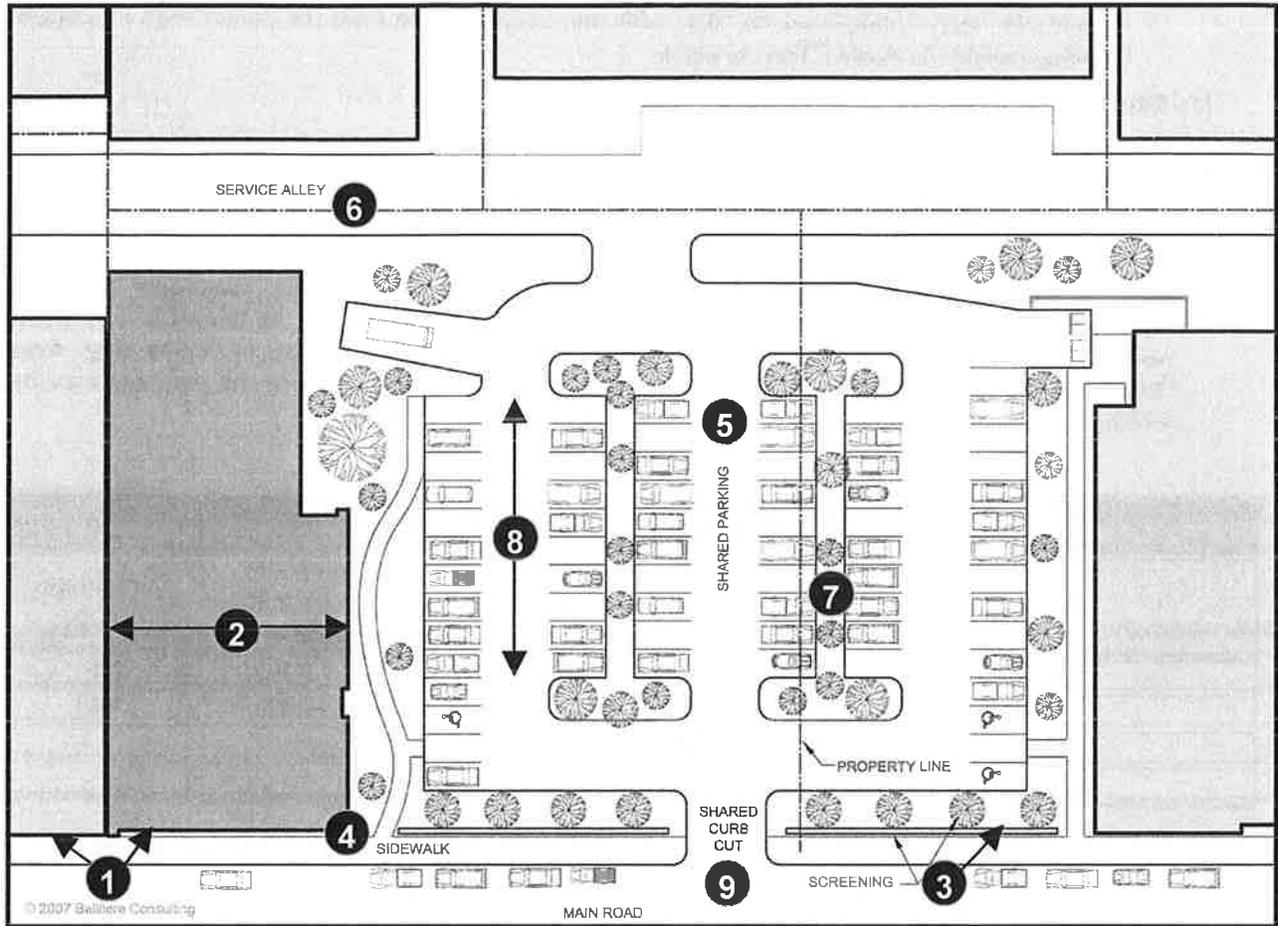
(above): General site plan layout includes aligning with neighboring buildings up at the sidewalk, and keeping all parking in the side or rear of the lot where it can be shared with neighboring properties.
